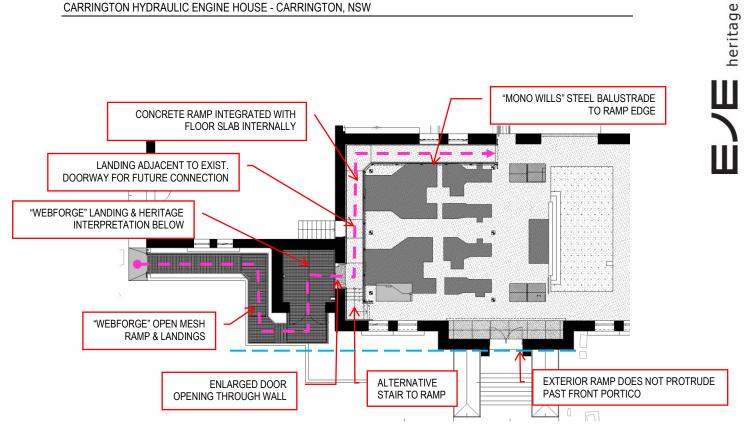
Proposed accessible entry ramp through western Accumulator Tower to the CHEH Engine Room – Refer Architectural Documentation for full design notes.
